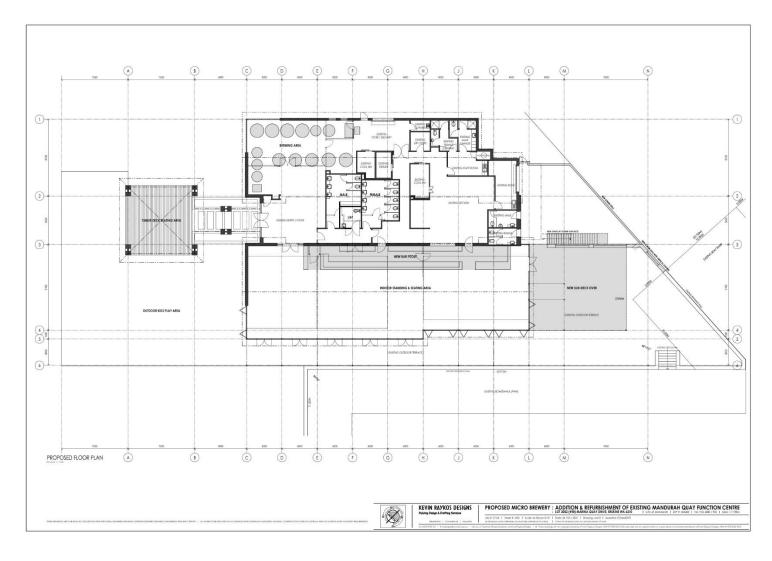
Floor Site Layout (source: Kevin Raykos Designs)
